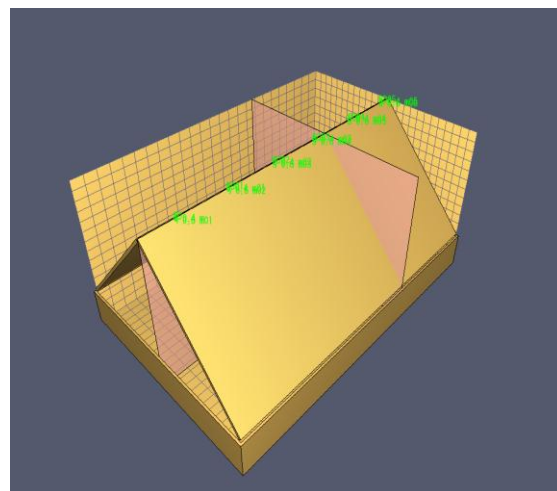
Object With Slope Roof, With Dimensions 20 M X 30 M X 13 M And Slope Bigger Than 20° And Proper Smoke Detectors Arrangement
